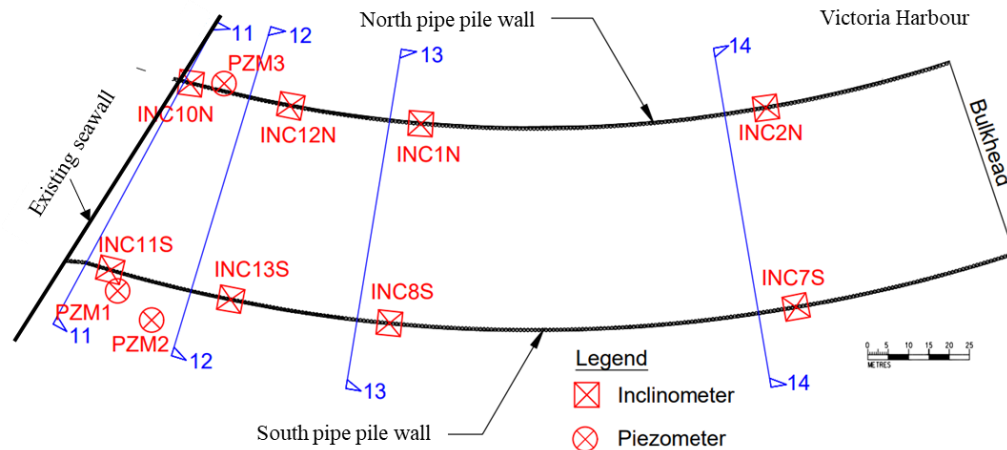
Plan of undersea tunnel showing the locations of the instruments
